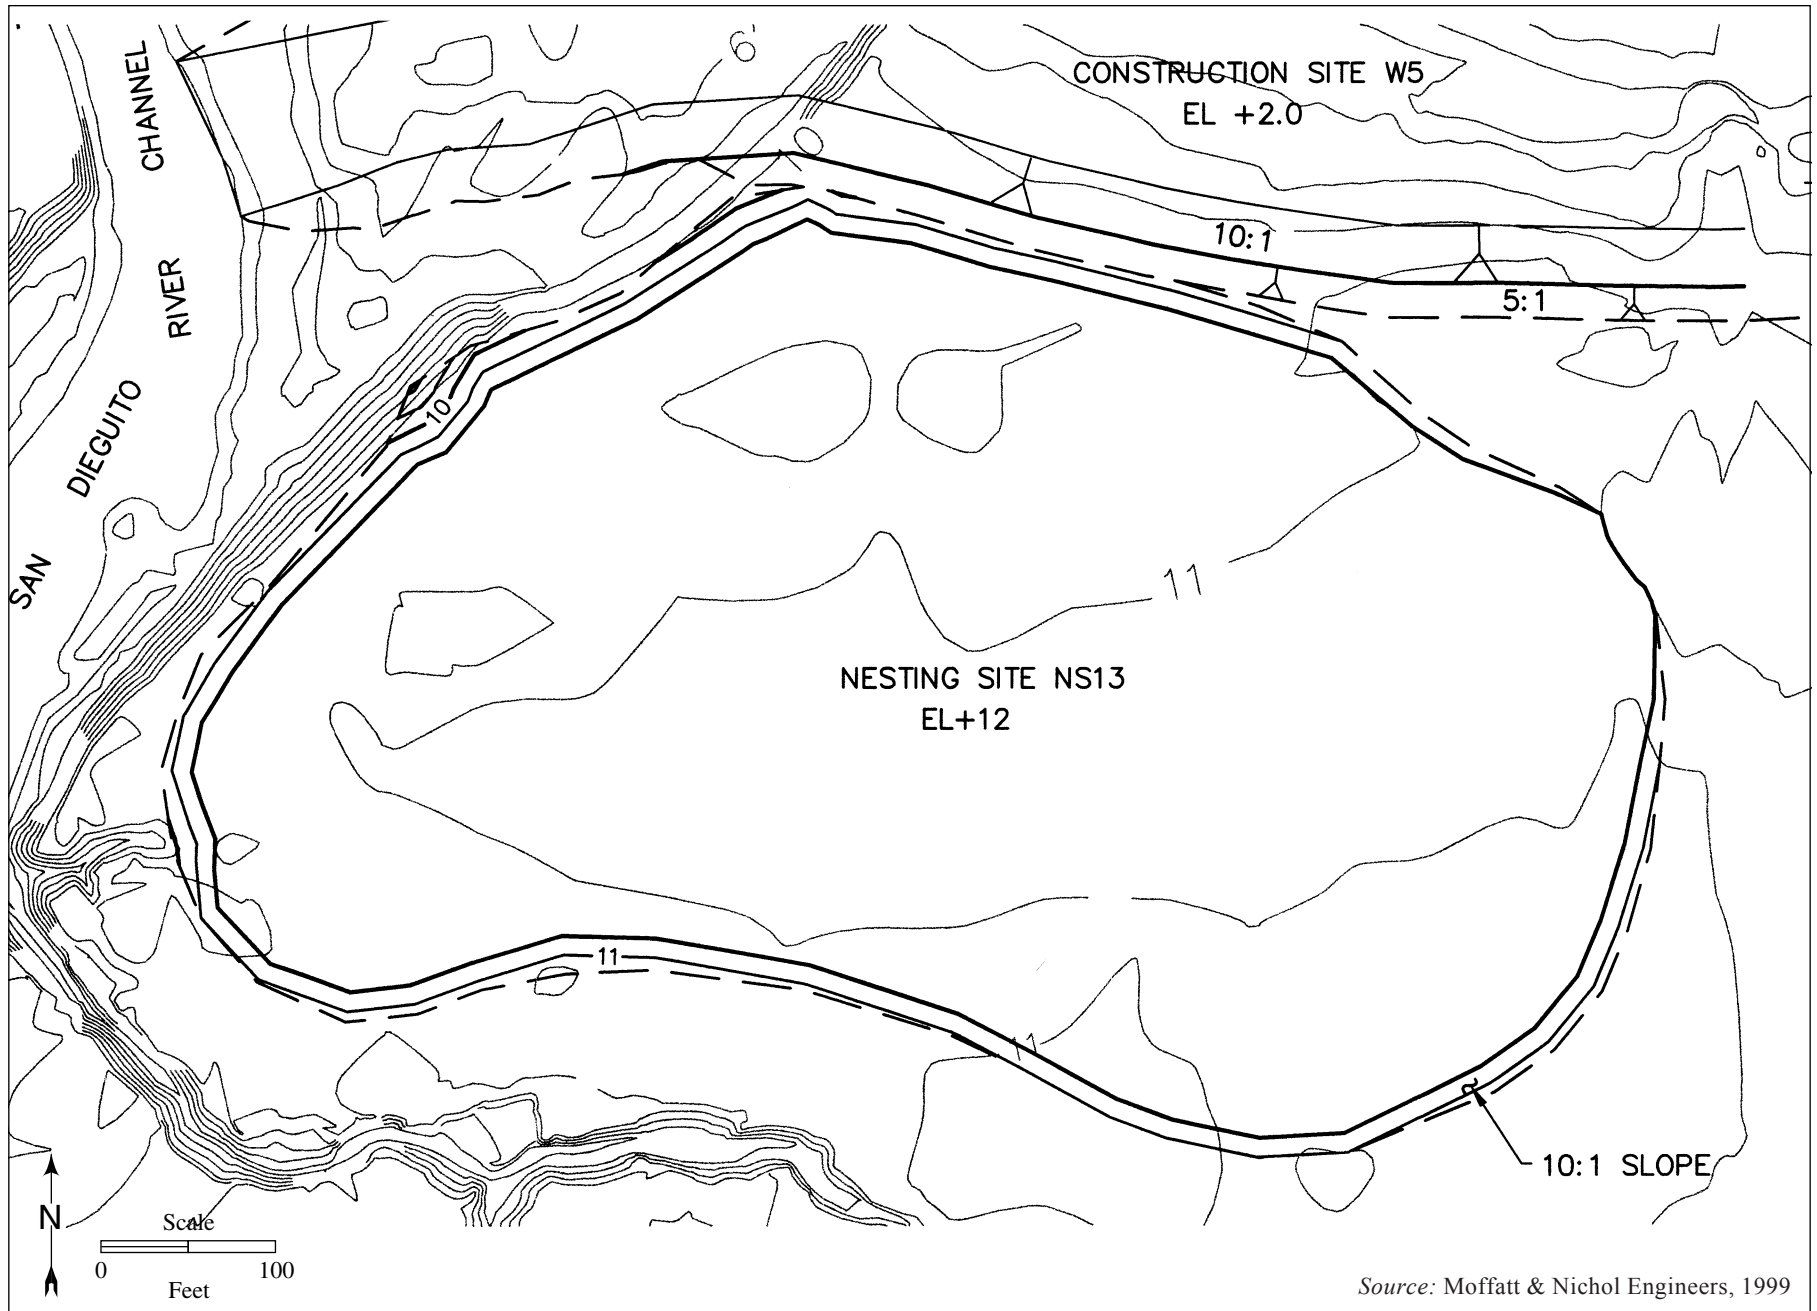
Nesting Site NS13 Grading Plan
